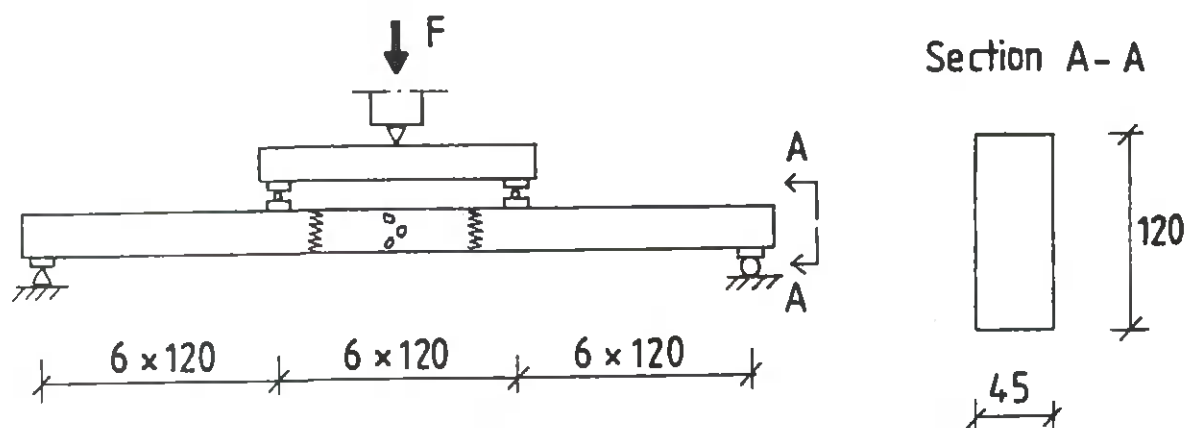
Principal test arrangement when one weak zone was tested at a time. All sizes in mm.
